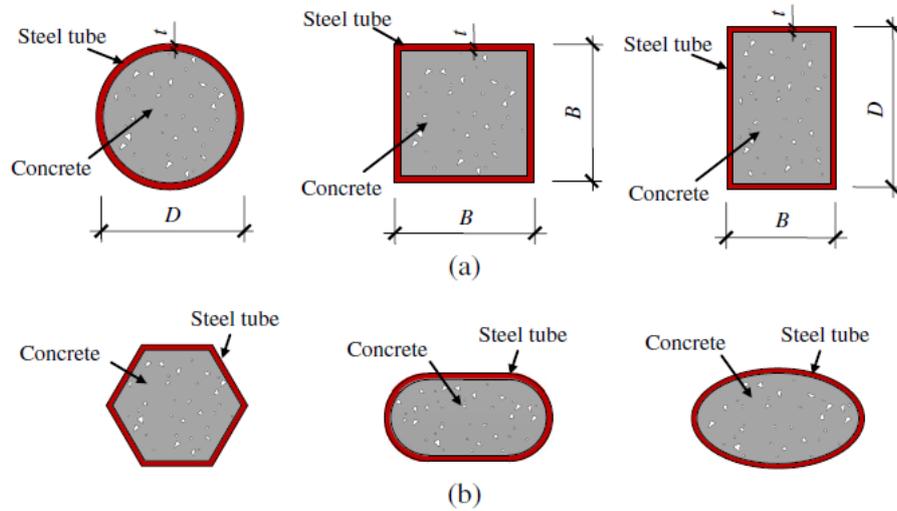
Typical cross - sections of CFST column (Han *et al.*, 2014)
